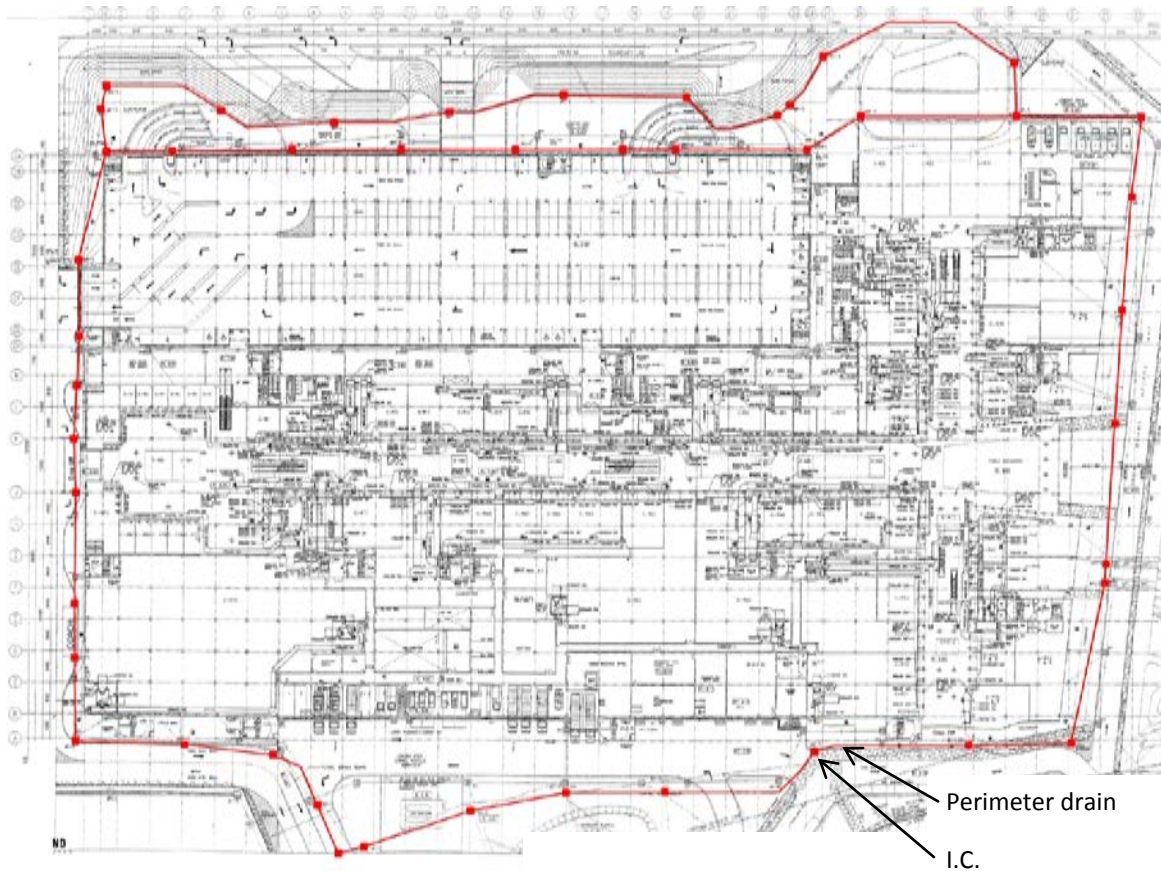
Stormwater drainage piping network of Setia City Mall.
